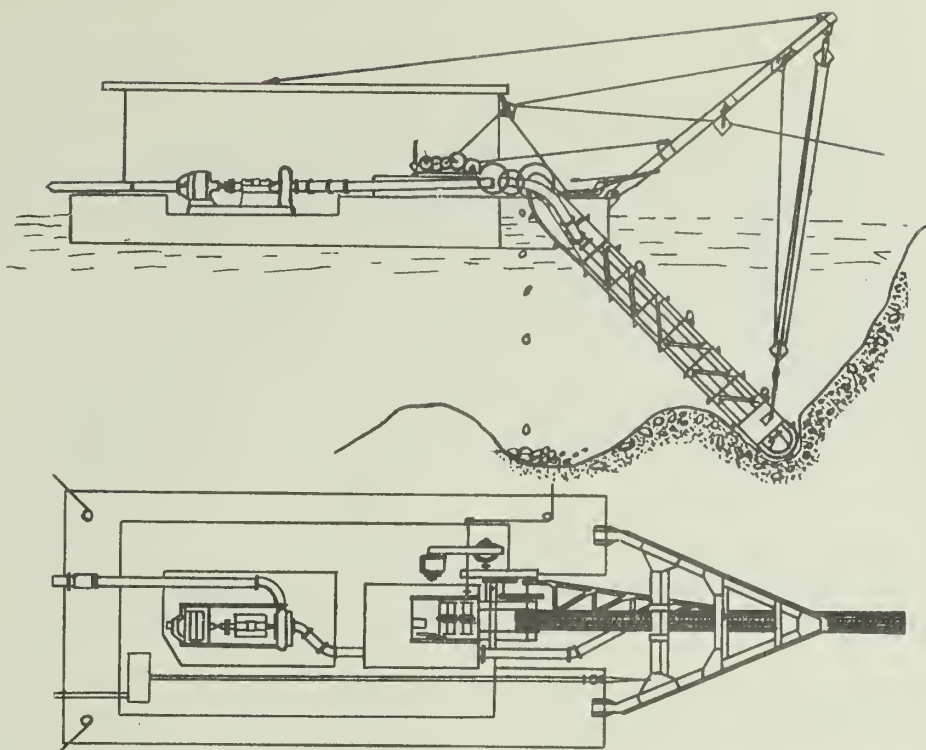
Plan and elevation of hydraulic dredge with traveling screen.
